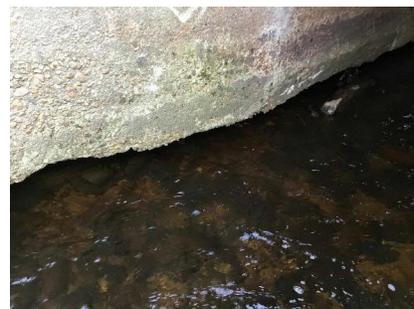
View of undermining and erosion of concrete structure during field assessment on November 12, 2018.
